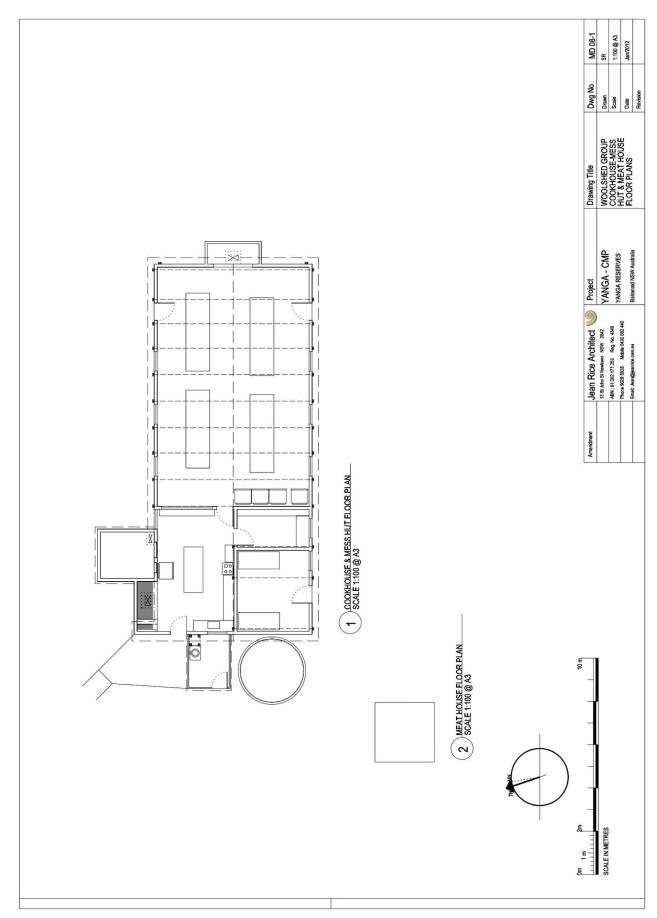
Woolshed Group Cookhouse floor plan. Jean Rice Architect, site assessment 2009.
